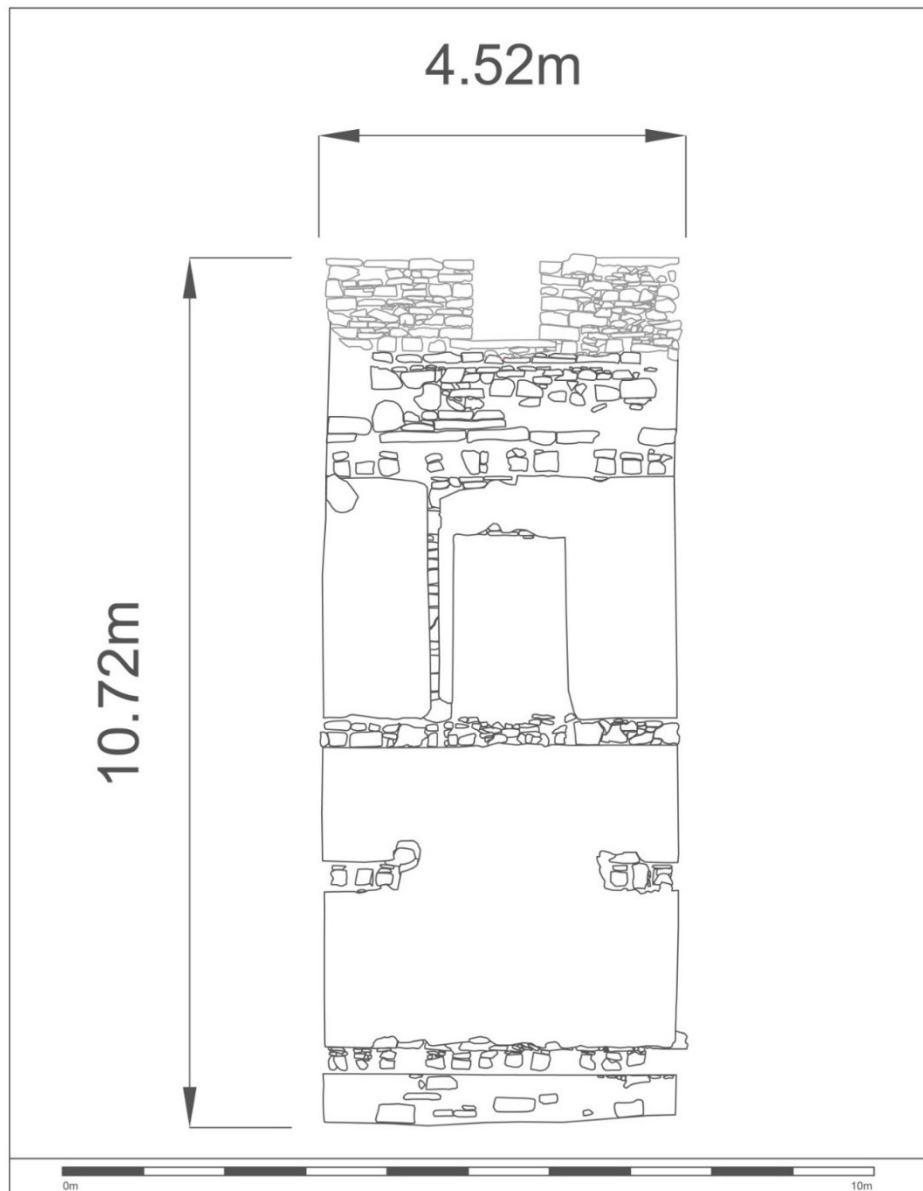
Internal elevation of the north wall of the signal tower at Carrowmably Signal Station.
